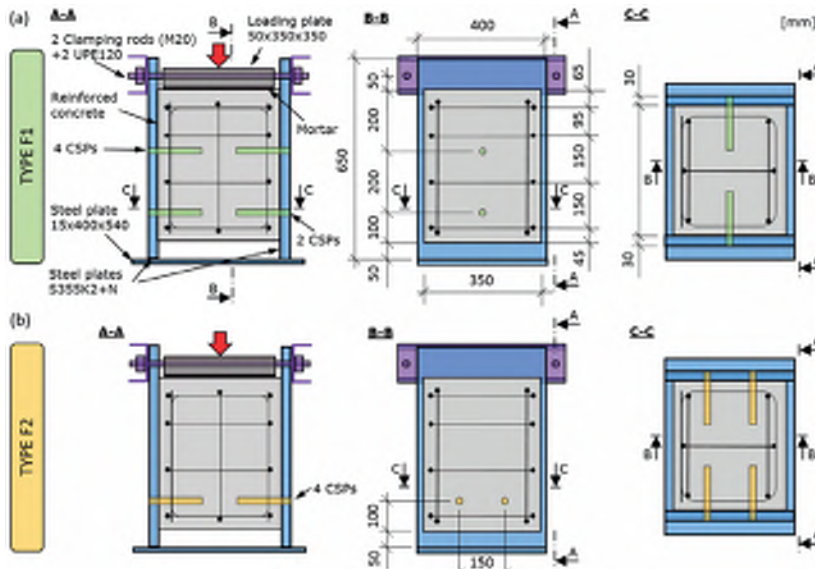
Fatigue test specimens, (a) Type F1 and (b) Type F2
